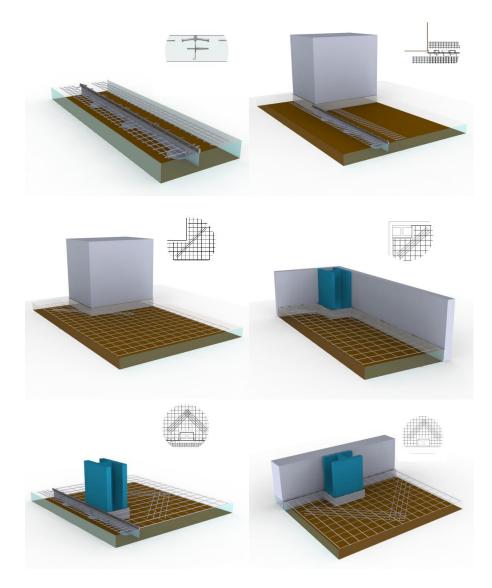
Generic examples of detailing around floor intrusions, such as columns and adjacent office areas
